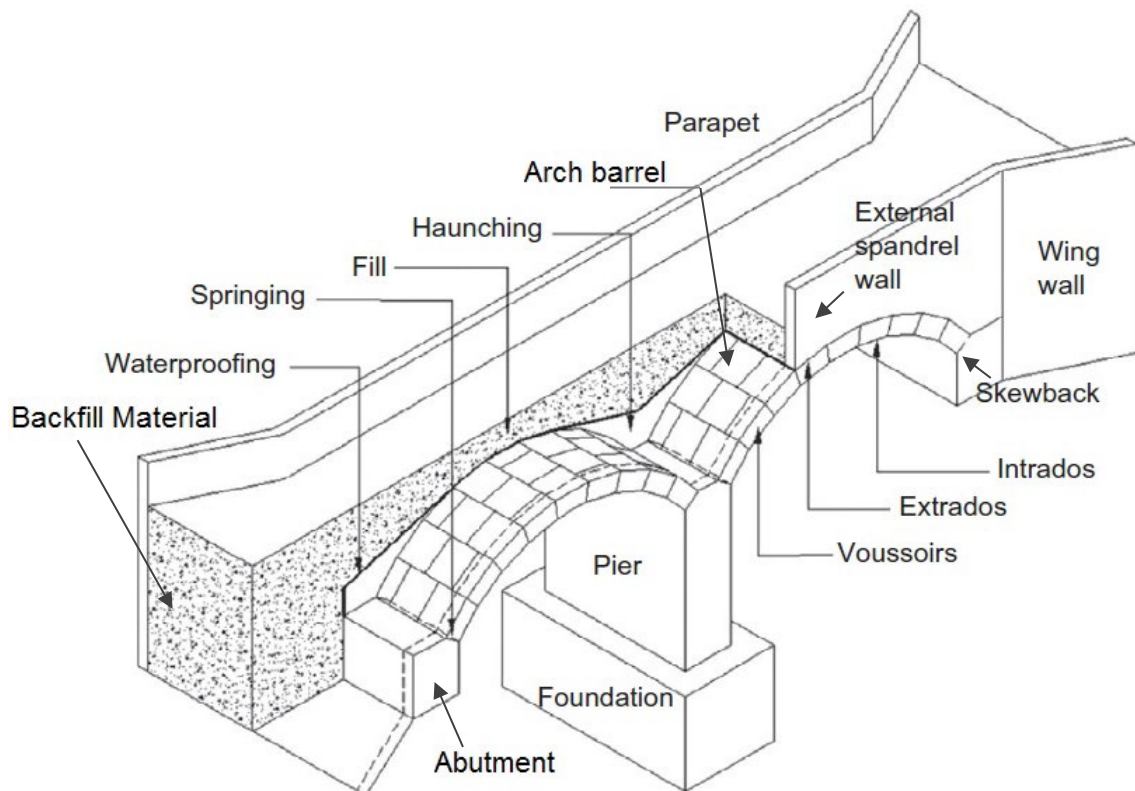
Elements of a masonry arch bridge (UIC Code 778-3R, 1994).
